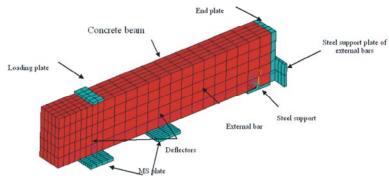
Constituent elements of strengthened reinforced concrete beam in ANSYS
